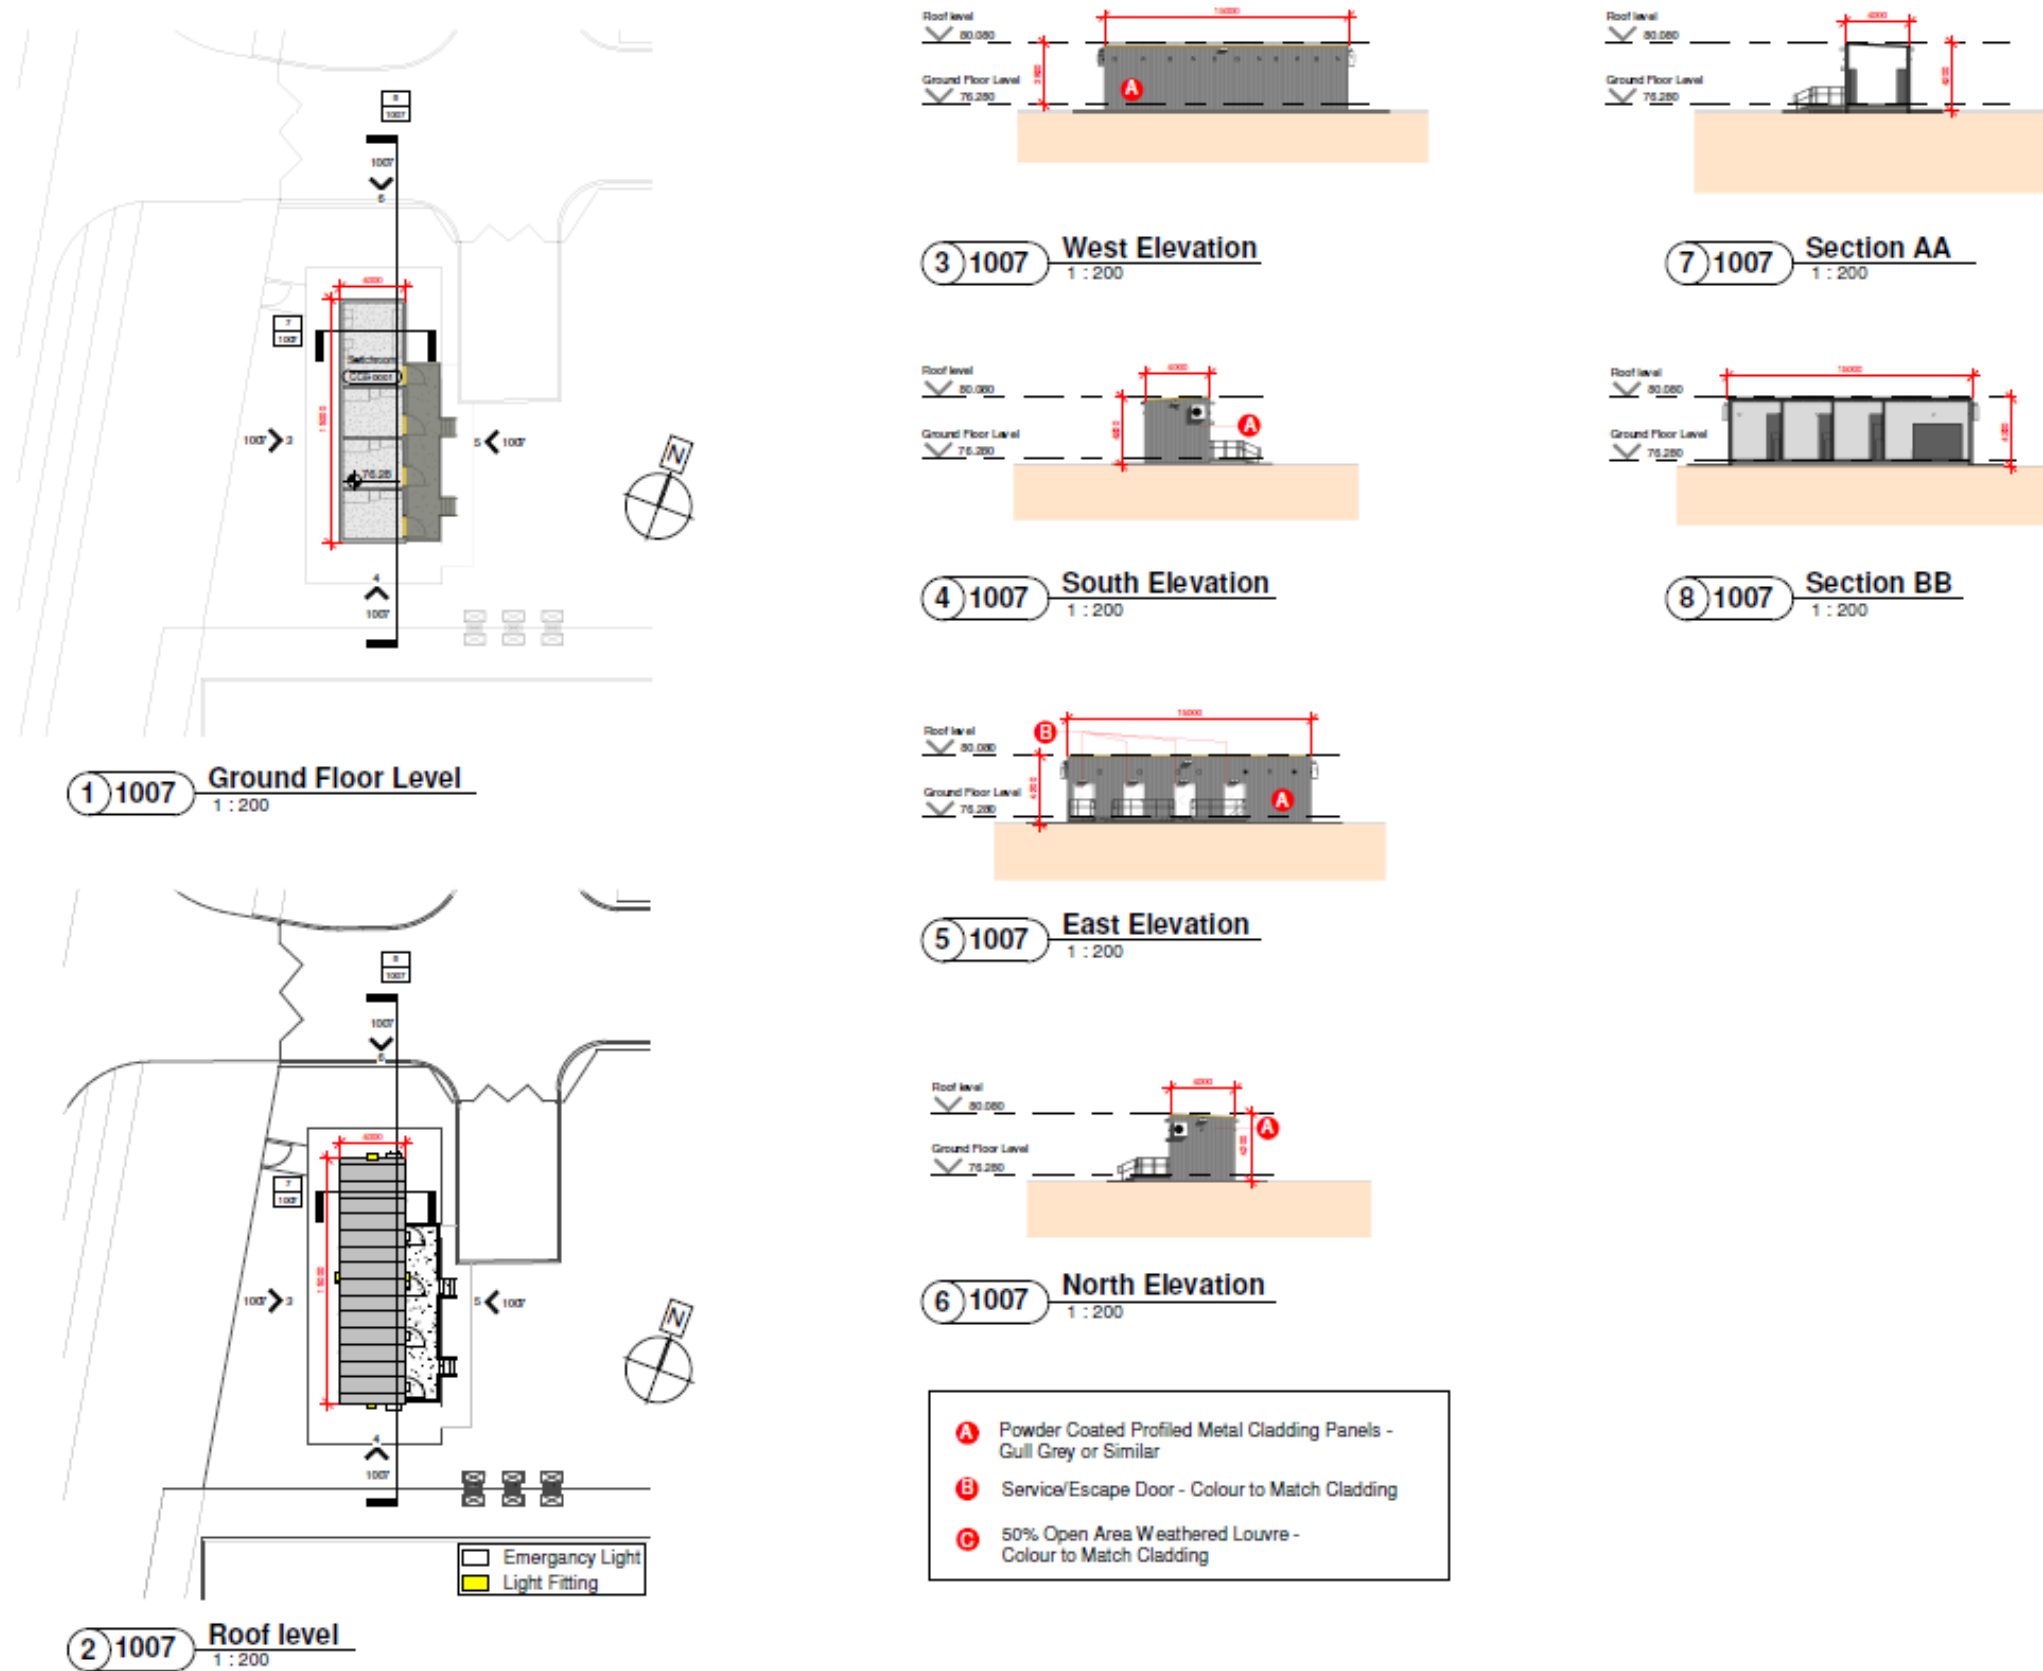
Client Control Building section showing Material Palette and Façade Detailing (Source KTA)
